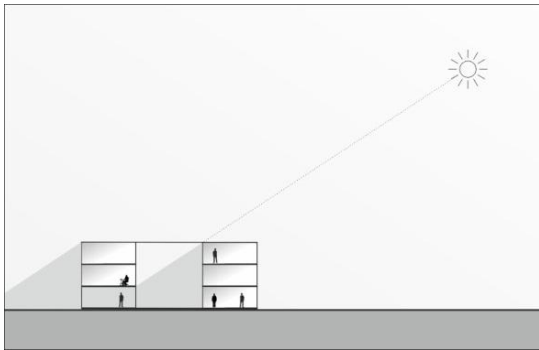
Three-story building B (built in 2010) with the atrium with closed roof
